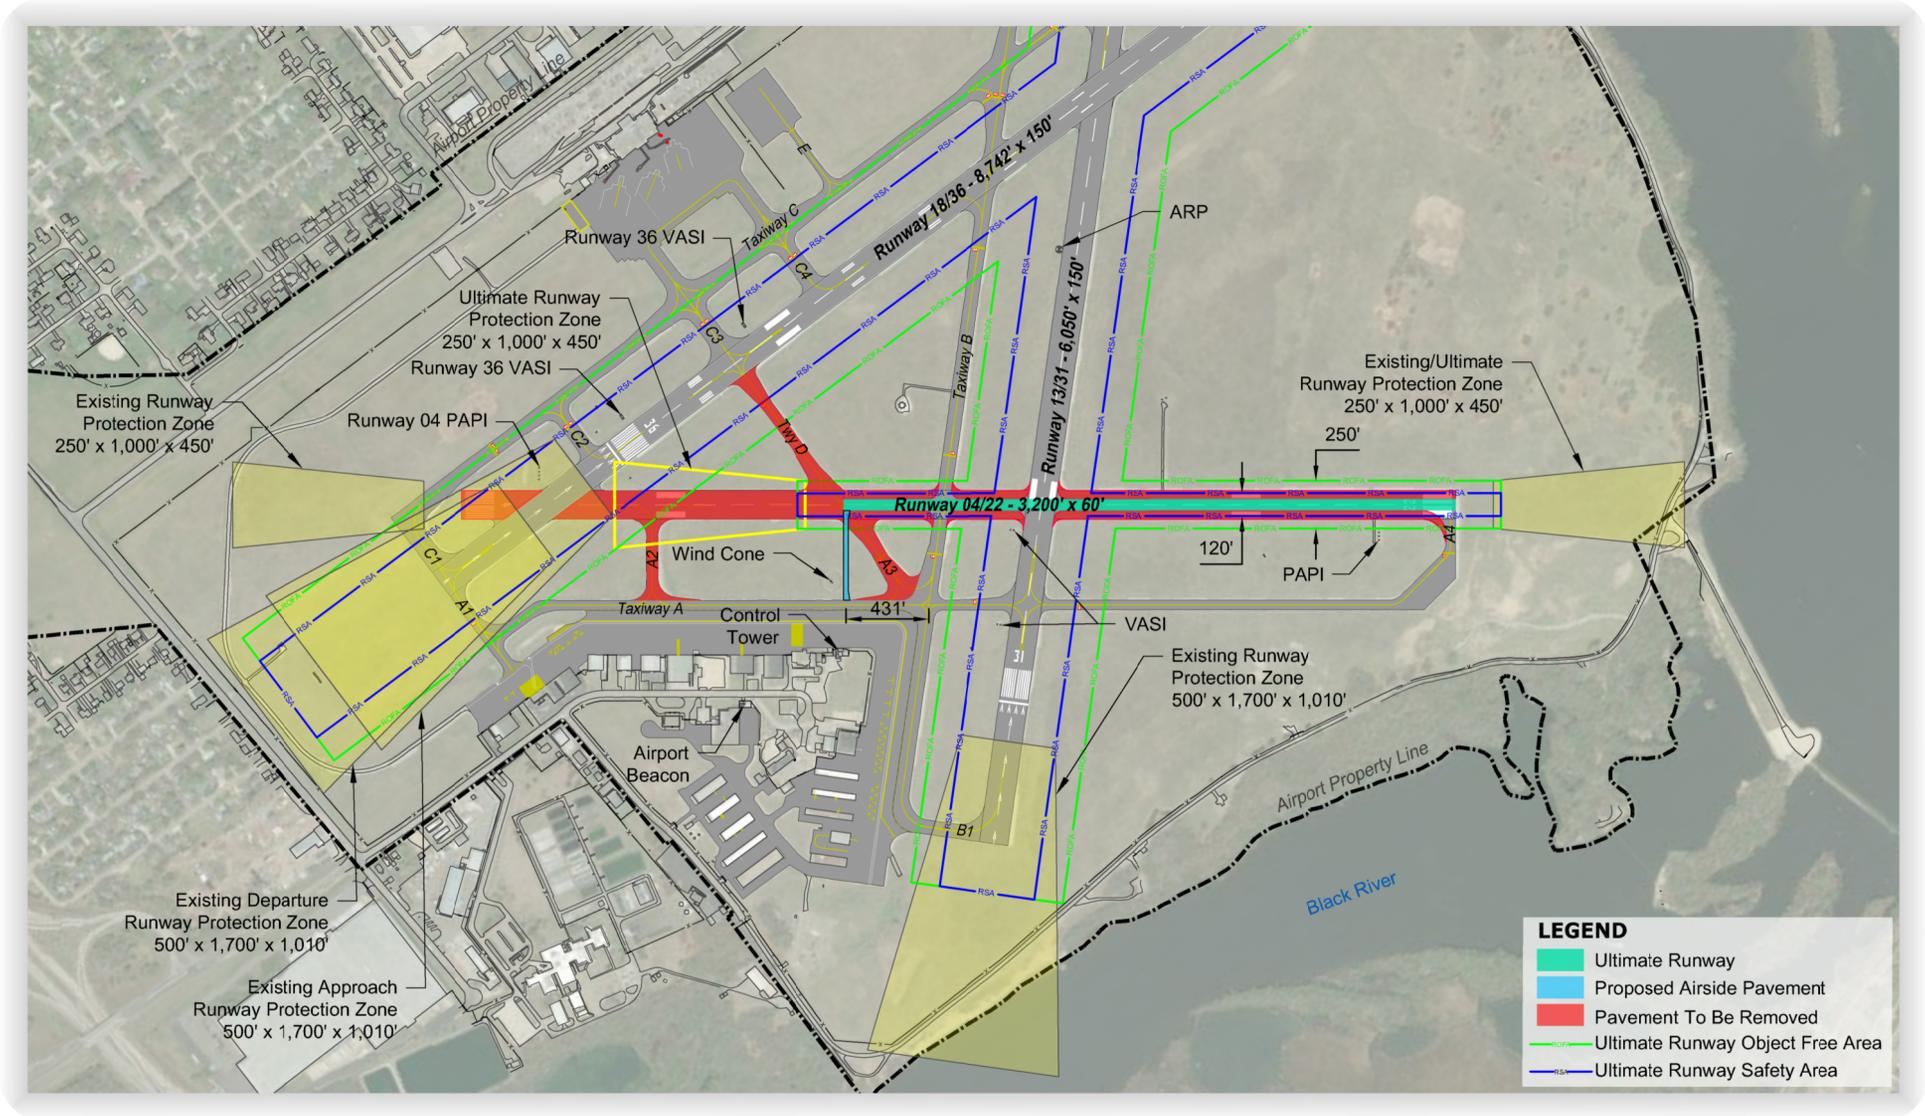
Runway 04/22: Alternative 2: Shorten On Runway 04 End
